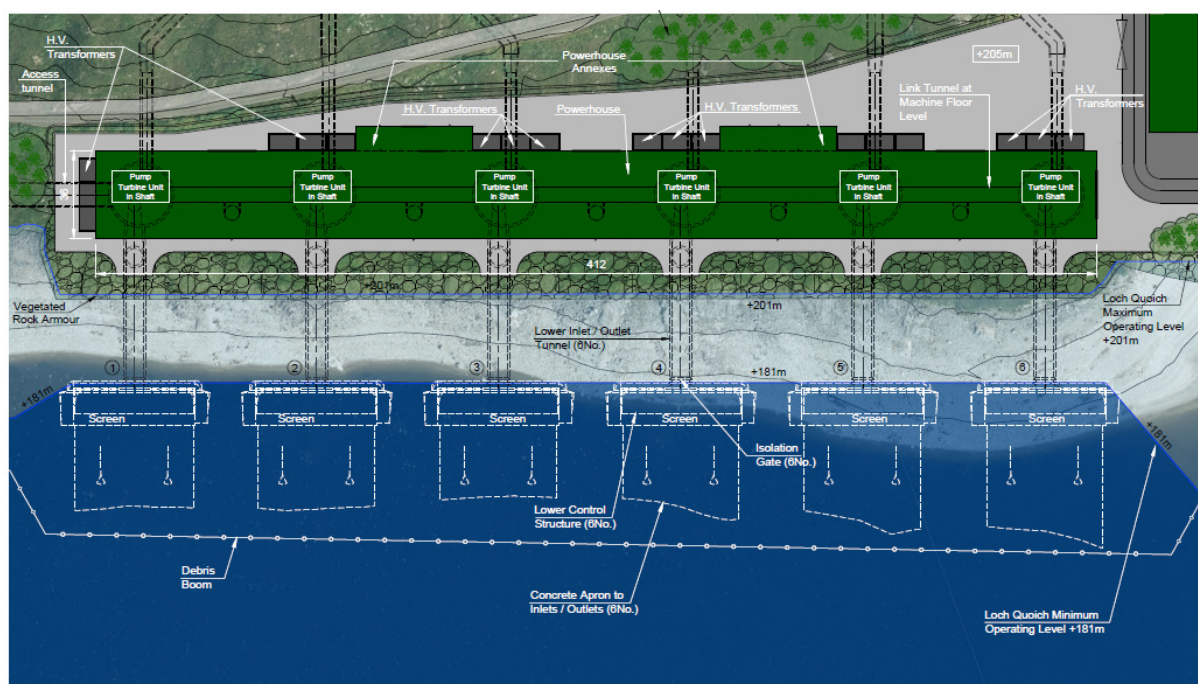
Powerhouse and Lower Control Works Plan (EIAR Figure 2.11)
